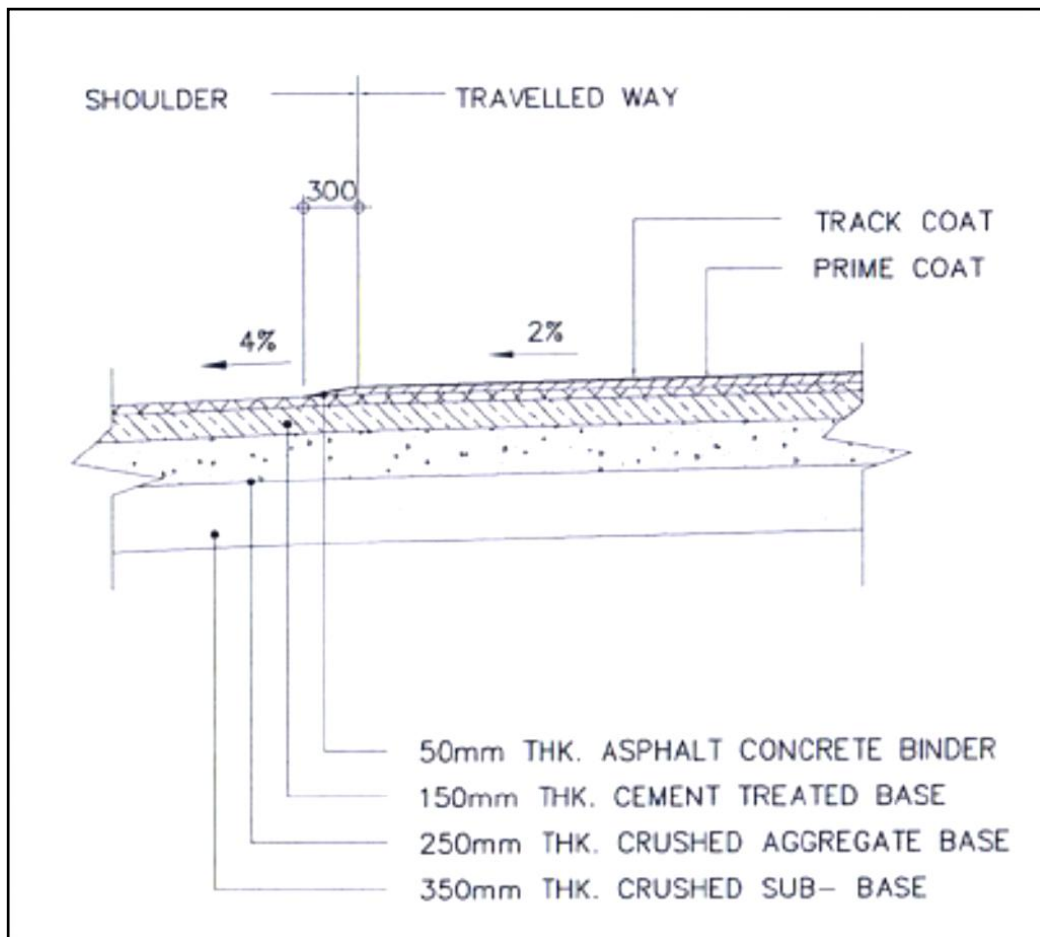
PAVEMENT STRUCTURE OF MAIN CARRIAGEWAY
